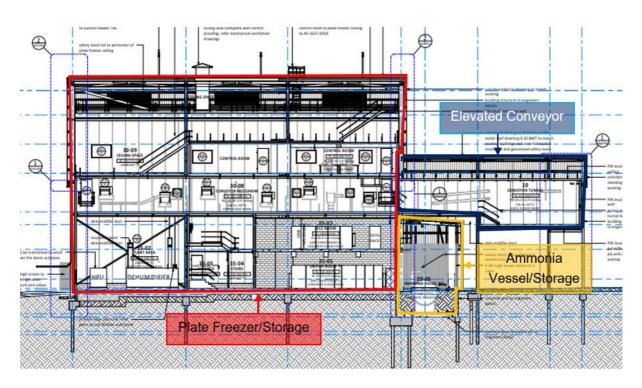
| Section - Plate Freezer / Storage Room & Elevated Conveyor & Ammonia Storage
